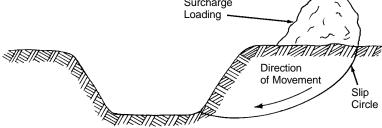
Typical trench wall failure in cohesive soil
